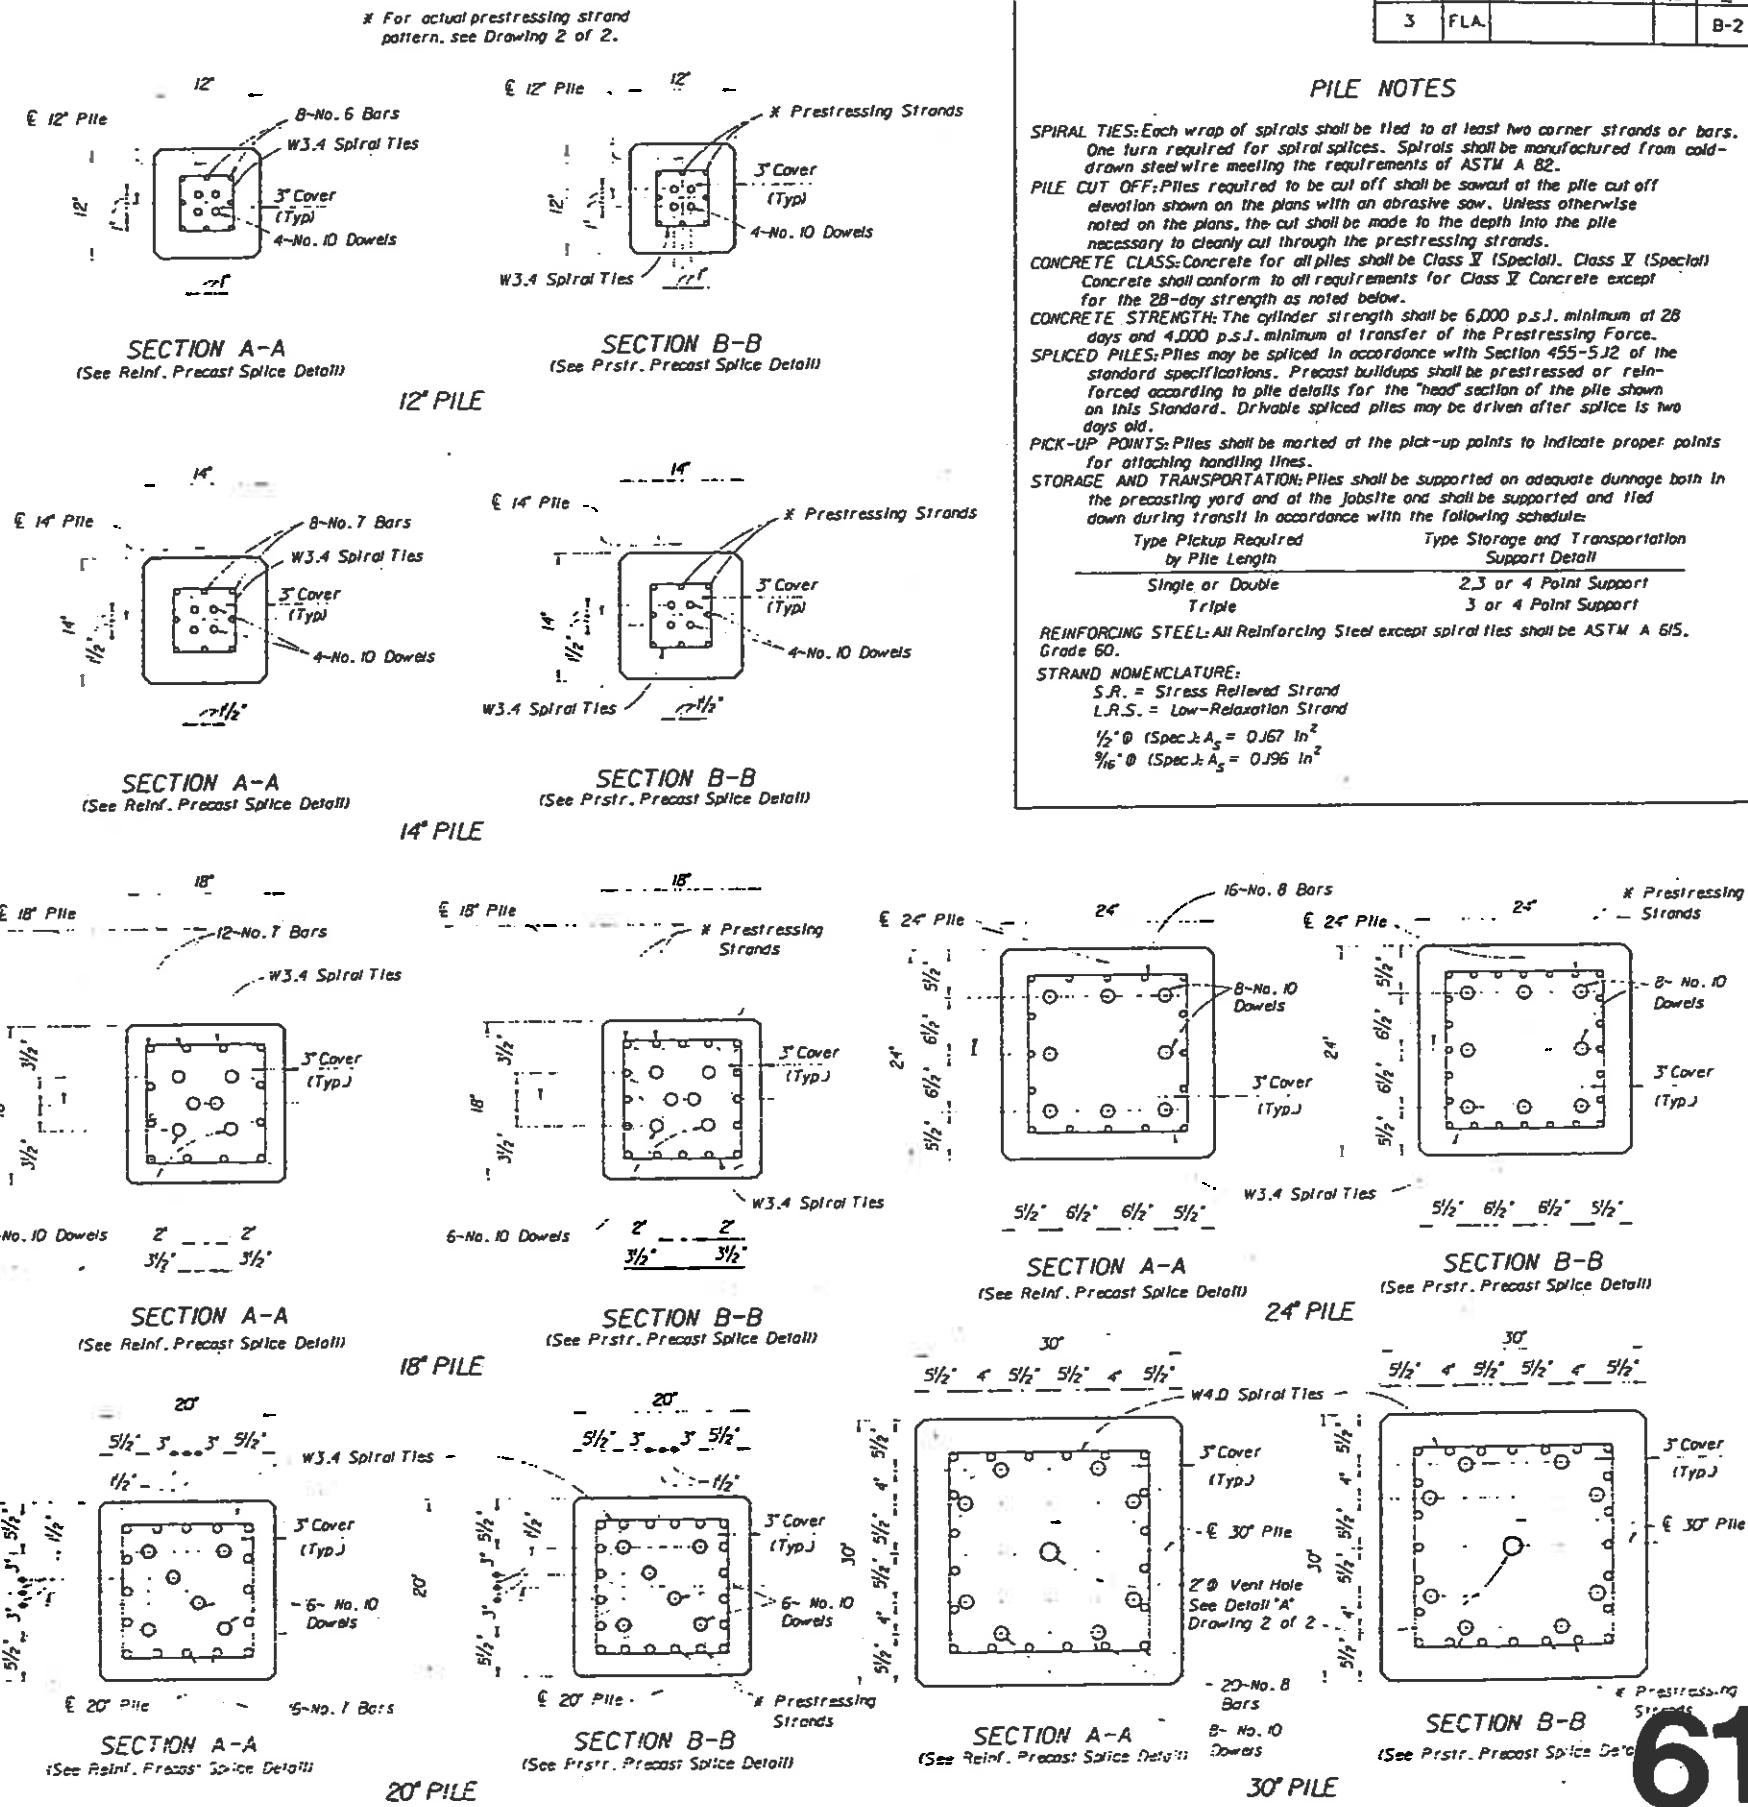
DETAILS FOR REINFORCED PRECAST & PRESTRESSED PRECAST PILE SPICES
